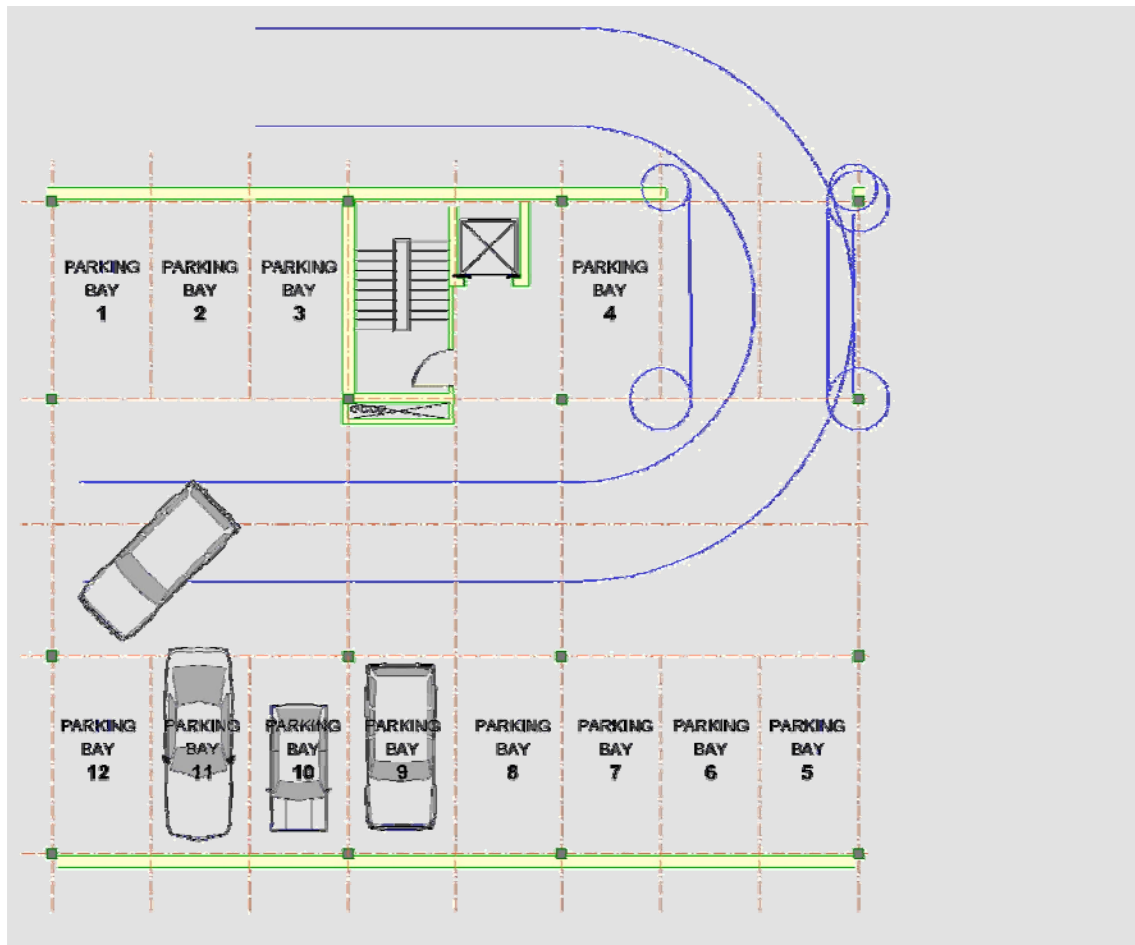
Typical arrangement for a basement car park in a multi-storey residential building
